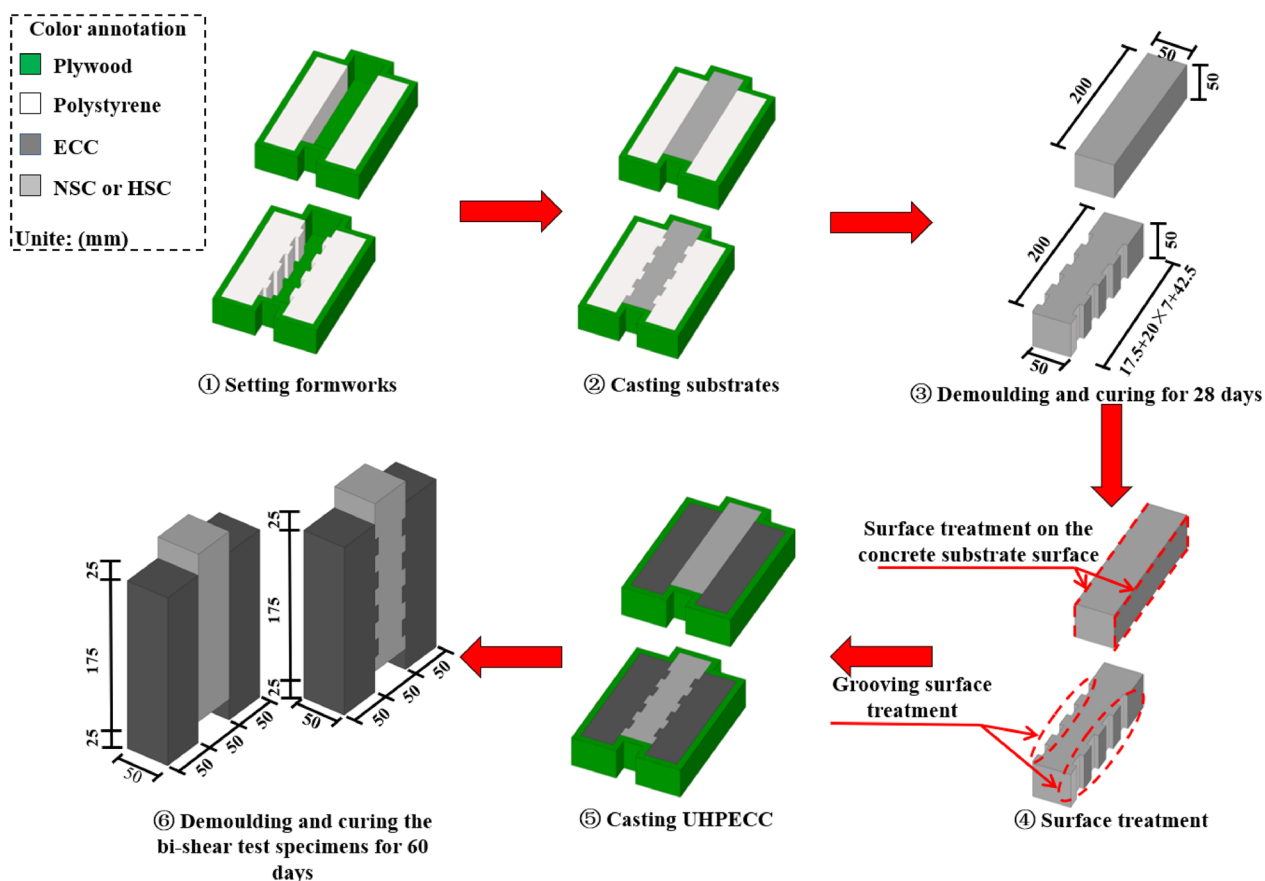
Fabrication progress and dimension of the push-out test specimens
